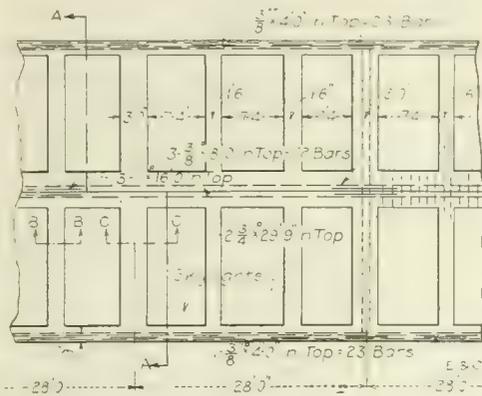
Plan of a Portion of the Roof Monitor of the Ford Motor Co. Building, Chicago, Ill.
